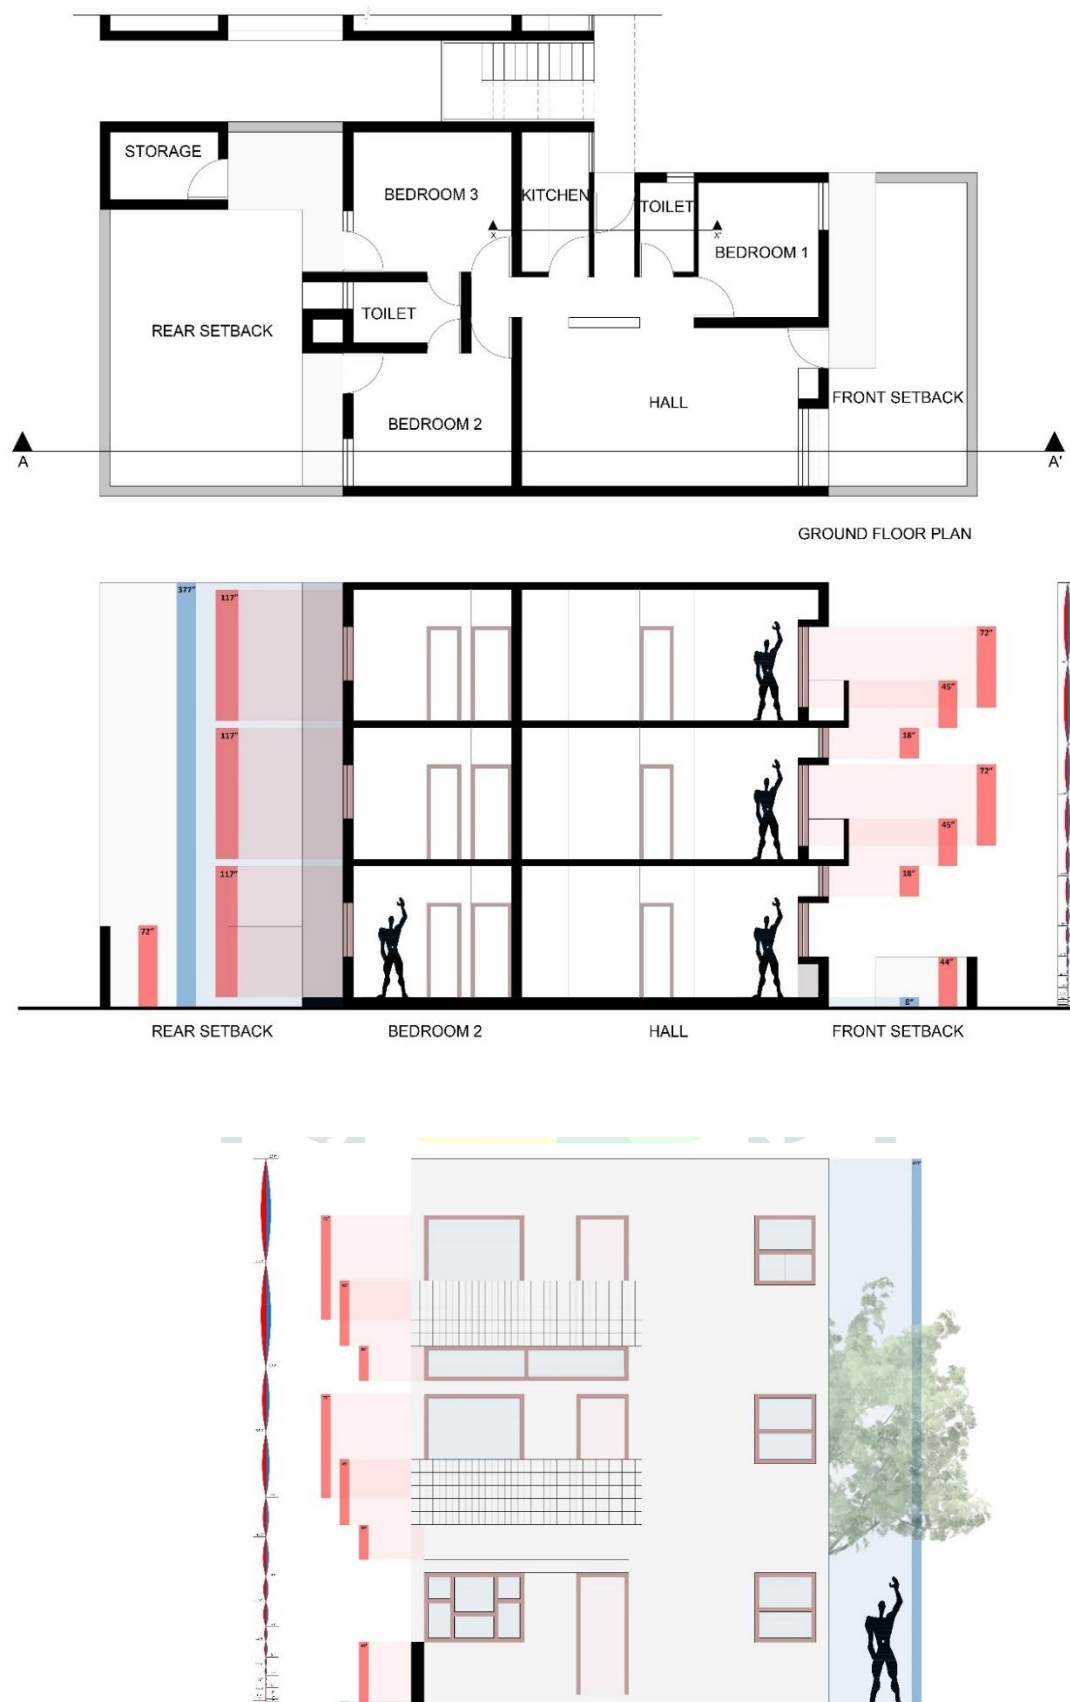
Typical Floor Plan, Section and Elevation showing total height of the house.
